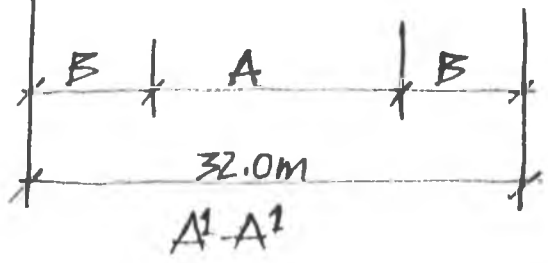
CROSS SECTION OF PIONEER ROAD
